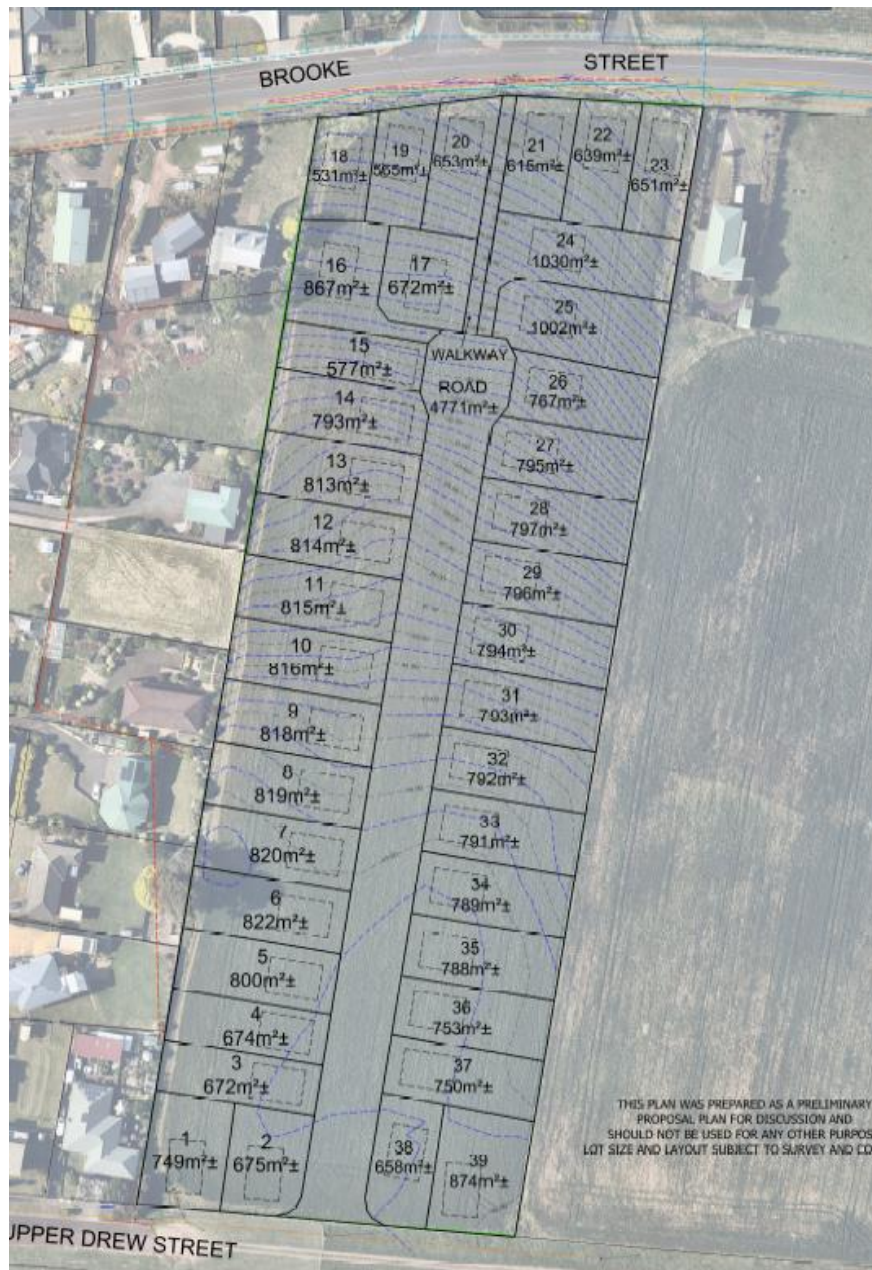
Proposed subdivision layout. Refer to Annexure 2 for detail.
